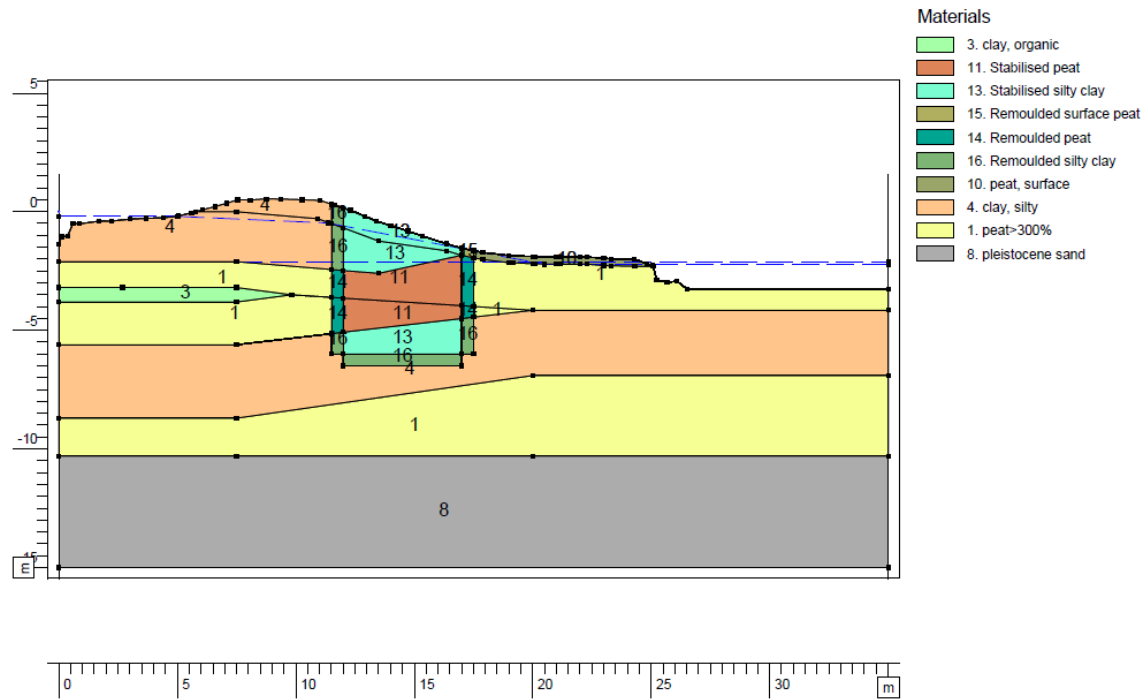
; The location of the 5,0 metre wide and between about 4,5 and 6,2 metre deep stabilised soil block in the slope of the levee of the Enkele Wiericke.
